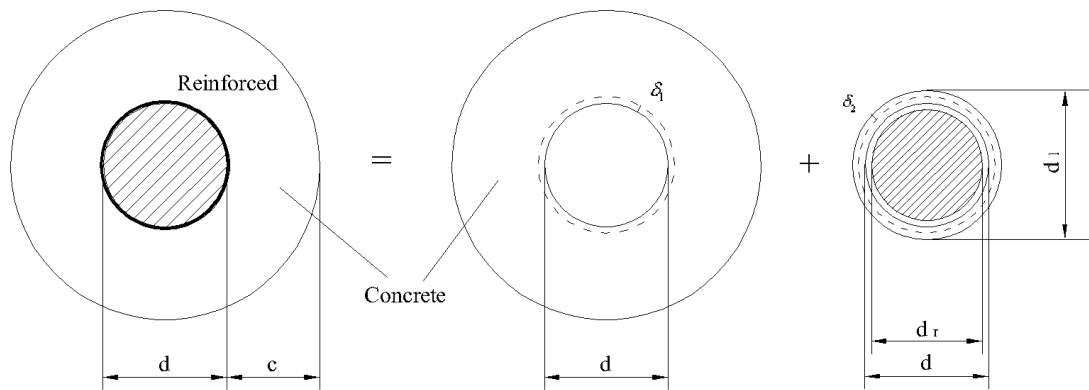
Reinforced concrete structures due to corrosion expansion force deformation maps
